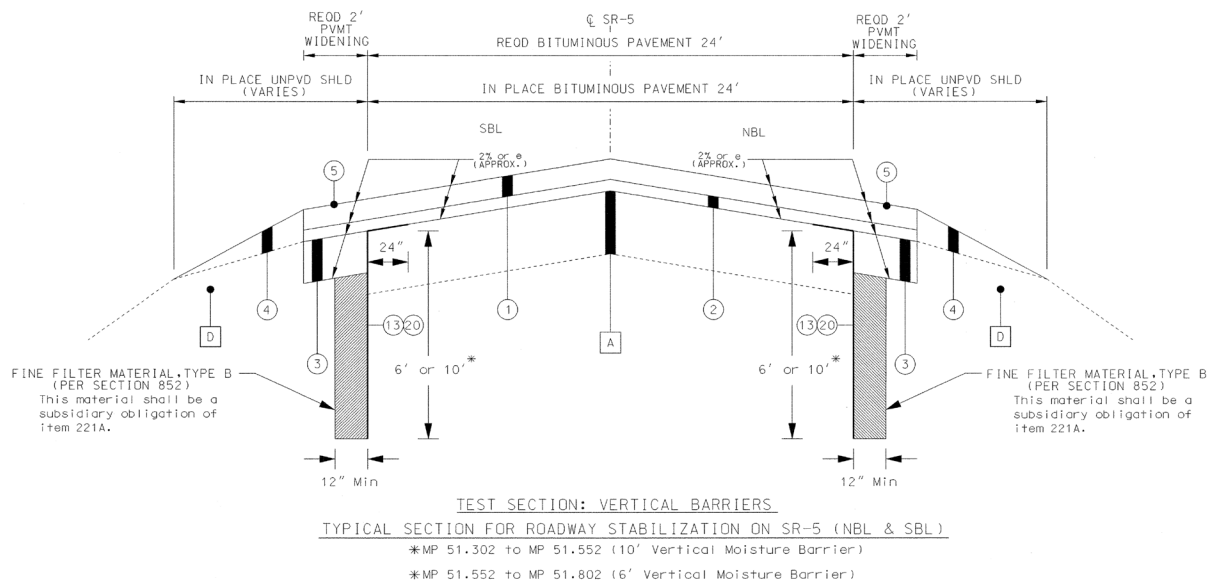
Vertical Moisture Barrier Cross-Section Plans (ALDOT 2015)
